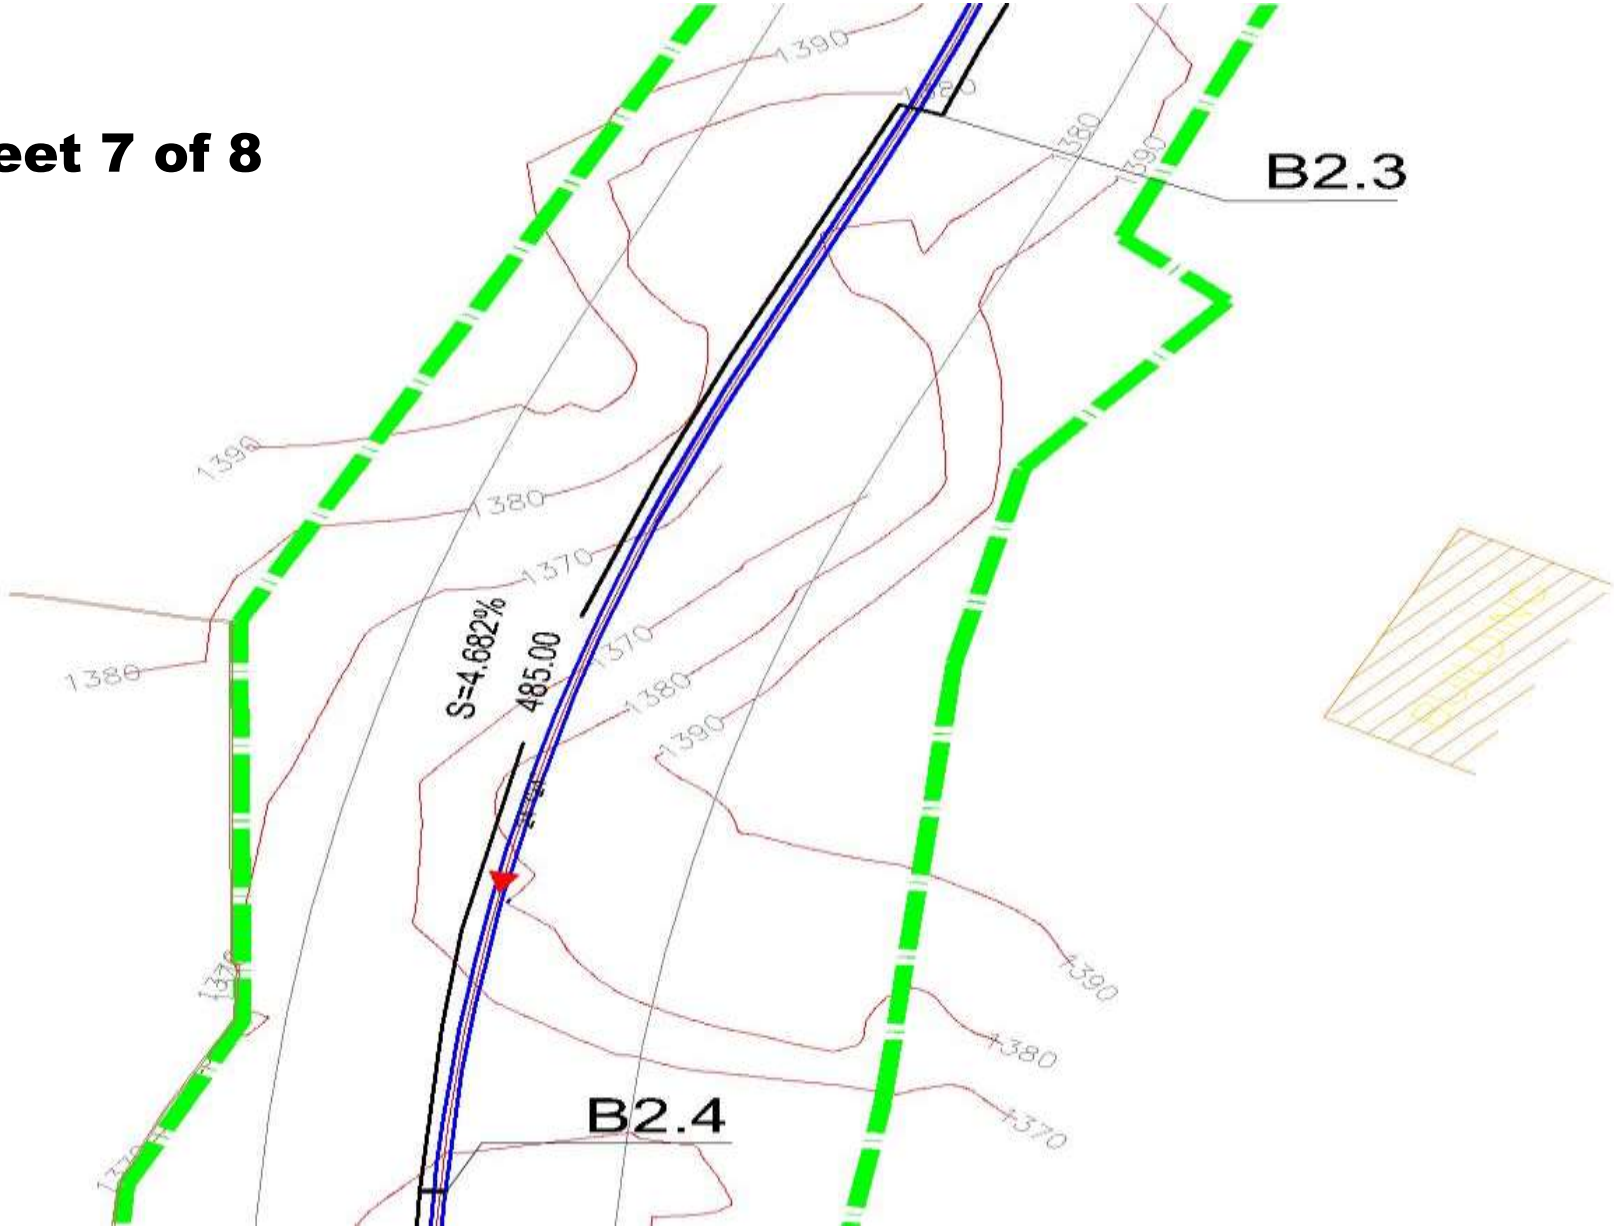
Storm drainage layout plan of Sub-catchment-1 part seven
